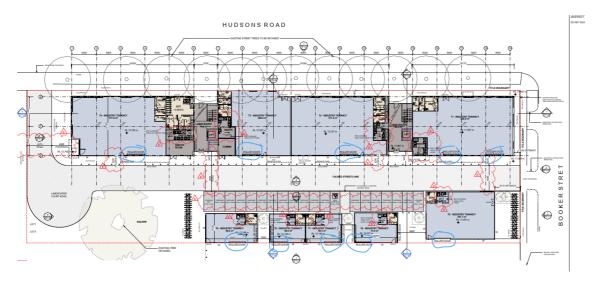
Location of roller doors, Source: North East Plot Proposed Ground Floor Plan TP100 Rev B by Six Degrees Pty Ltd
